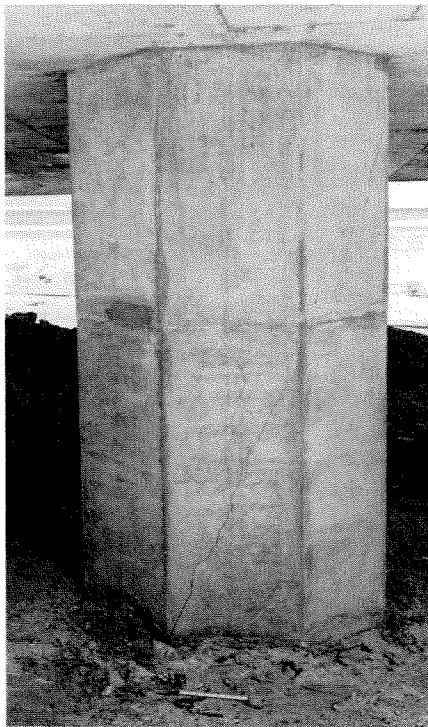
Damaged column on the remaining western section of the collapsed overcrossing, Golden State-Antelope Valley interchange.
